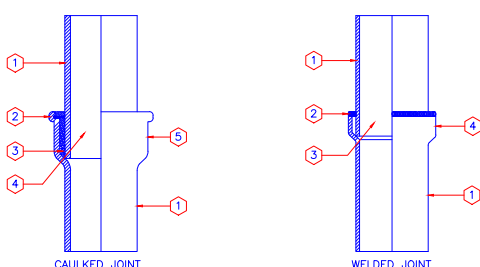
DETAIL VERTICAL PIPE SUPPORT (AT PIPE SHAFT)
